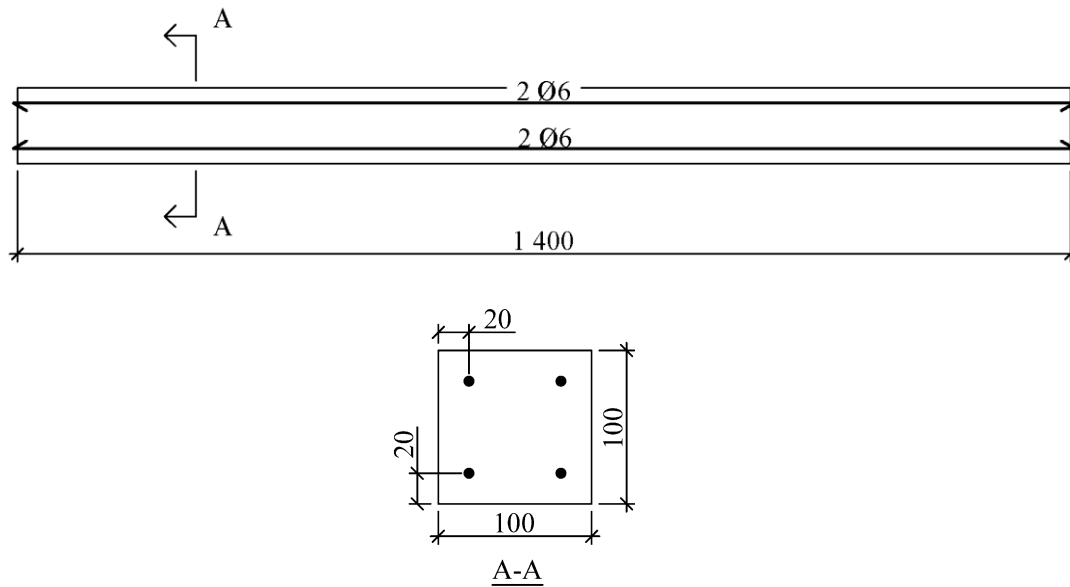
Geometry and reinforcement arrangement of the tested beams [mm].
